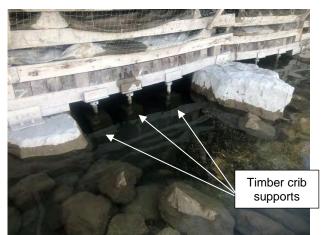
Fish shelter and timber crib wall supports (September 13, 2021)
